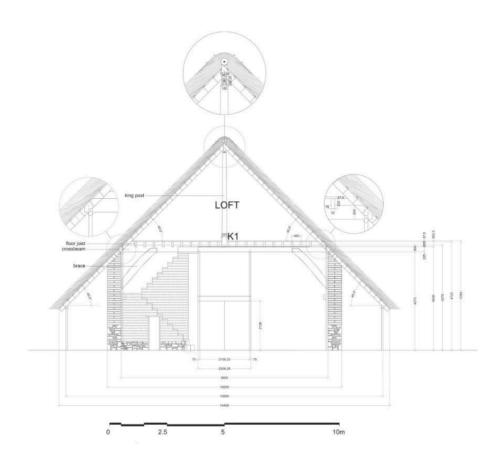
IDEALISED RECONSTRUCTION OF CROSS-SECTION A-A', WITH 'PROP-AND-LINTEL' OR 'POST-AND-BEAM' ROOF CONSTRUCTION. THE DETAILS OF THE WALLS ARE HYPOTHETICAL. THE POST PITS HAVE BEEN OMITTED.
